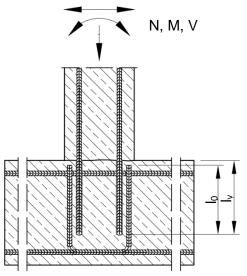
Anchoring of reinforcement to cover the line of acting tensile force
